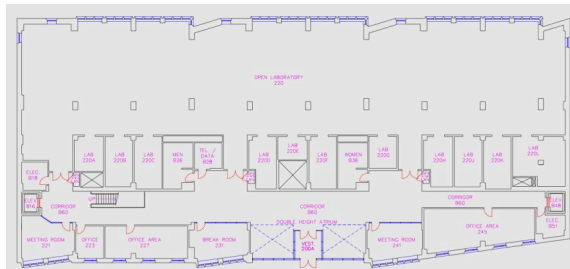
Modified floor plan of the ICTAS building
